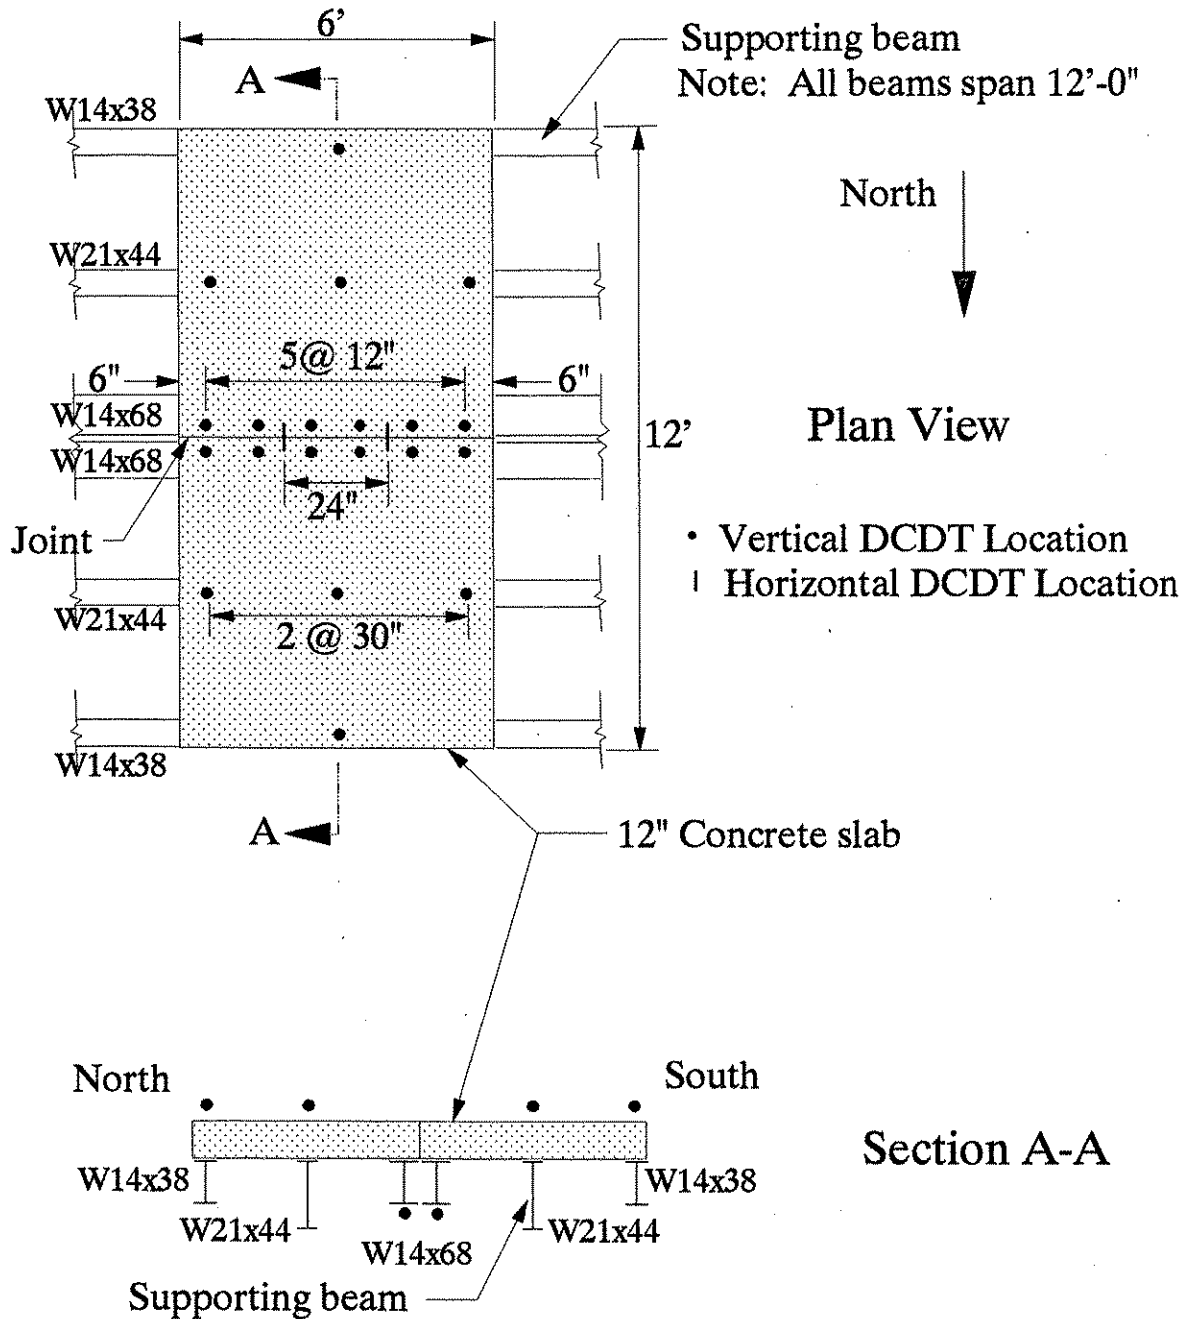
Displacement instrumentation for first full-scale fatigue test slab (with 1.5-inch steel dowels at 12-inch spacing)
